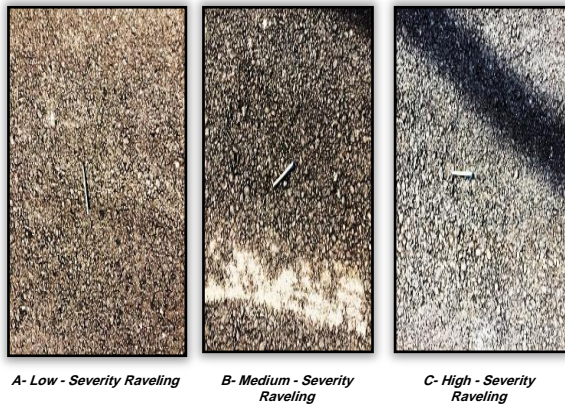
Raveling Distress severity Road No. (9) (Fair condition)
